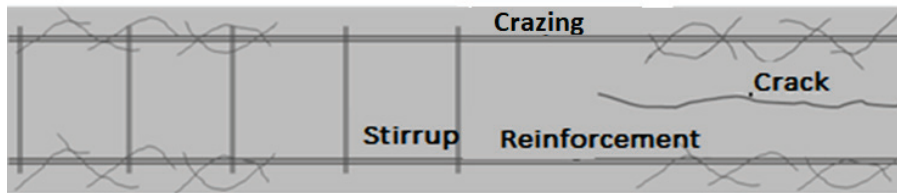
How crack the crack formation is affected in a reinforced concrete beam damaged by ASR.
